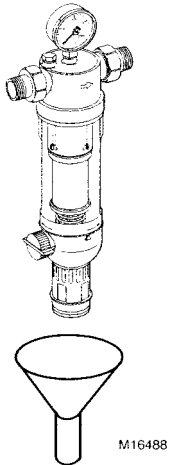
Ideal F76S installation. A funnel mounted directly under the backwash port is the best installation layout.
